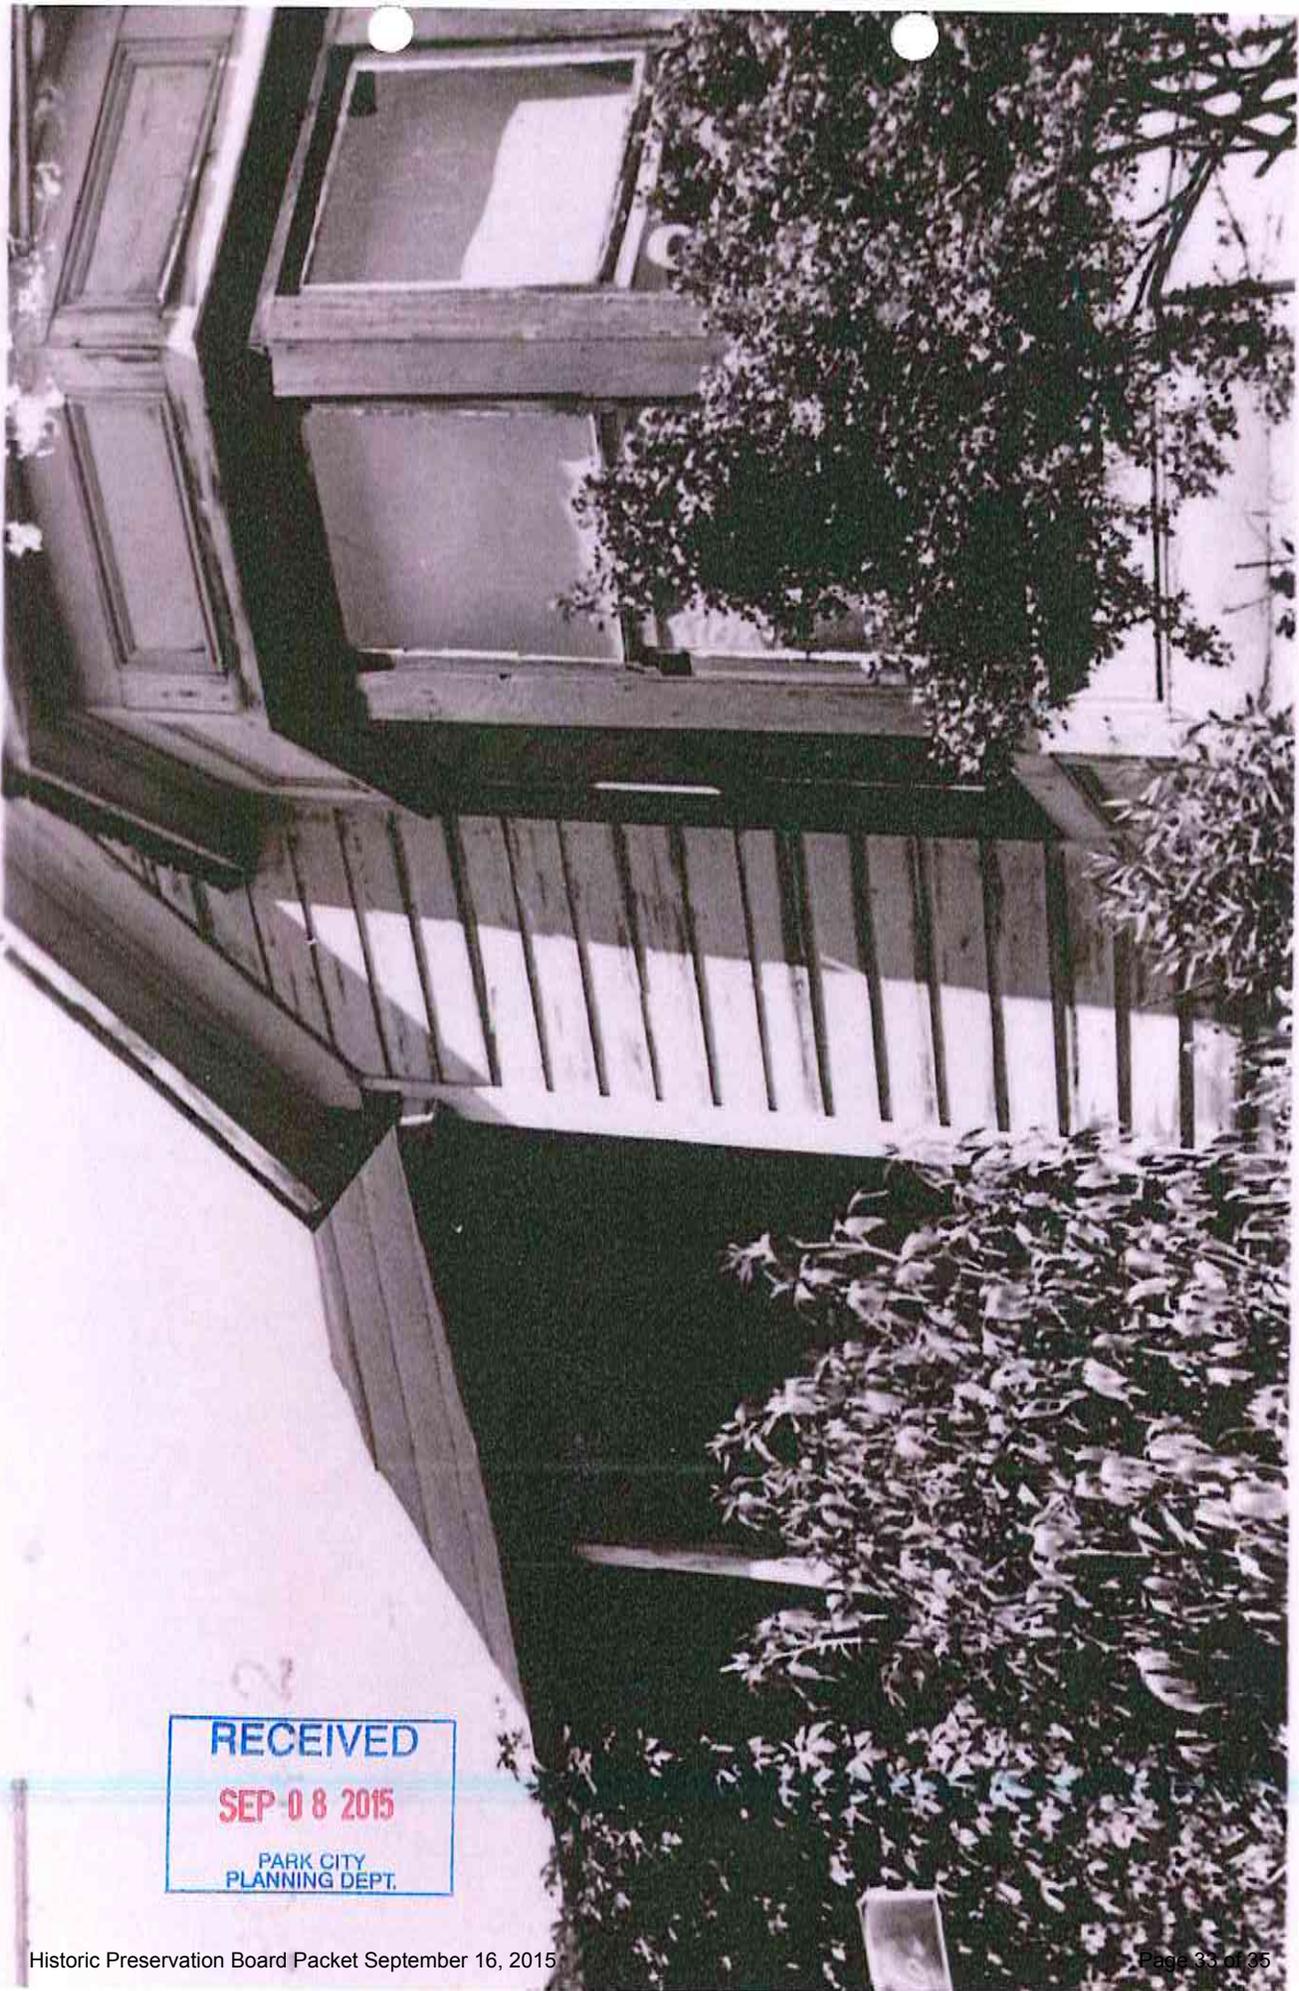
West elevation (primary façade). Camera facing east, 2006.
